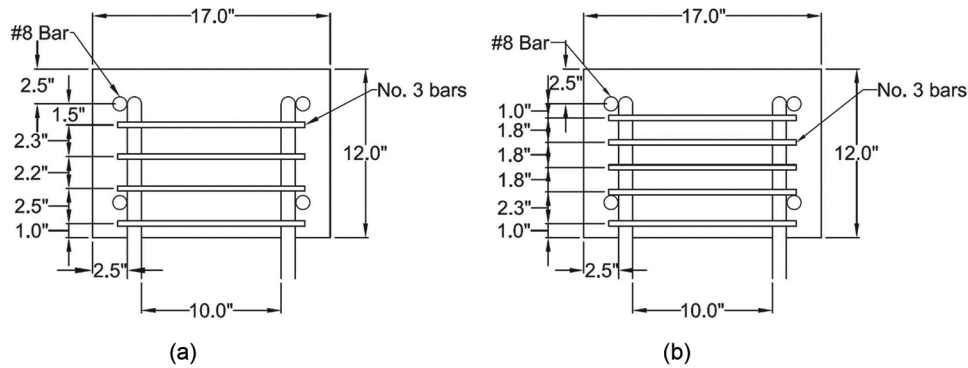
Plan view of hooked bars with confining reinforcement oriented perpendicular to bar being developed satisfying maximum spacing requirement in ACI 318-14, Section 25.4.3.2: (a) four No. 3 (No. 10) hoops; and (b) five No. 3 (No. 10) hoops. (Note: 1 in. = 25.4 mm.)
